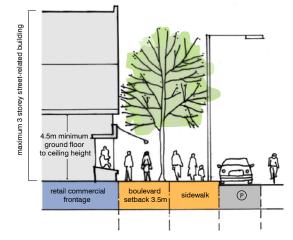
Section - Built Form and Public Realm Histroic Core Special Condition
